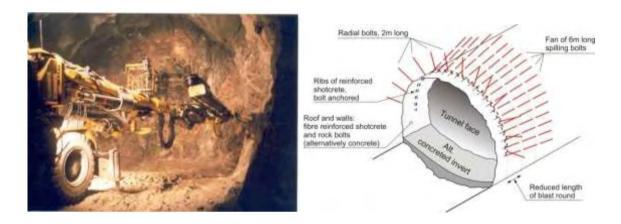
Drill and blast excavation (left side) in the Frøya subsea road tunnel, combination of rock bolts, shotcrete, invert lining and reinforced ribs for rock support (right side).
